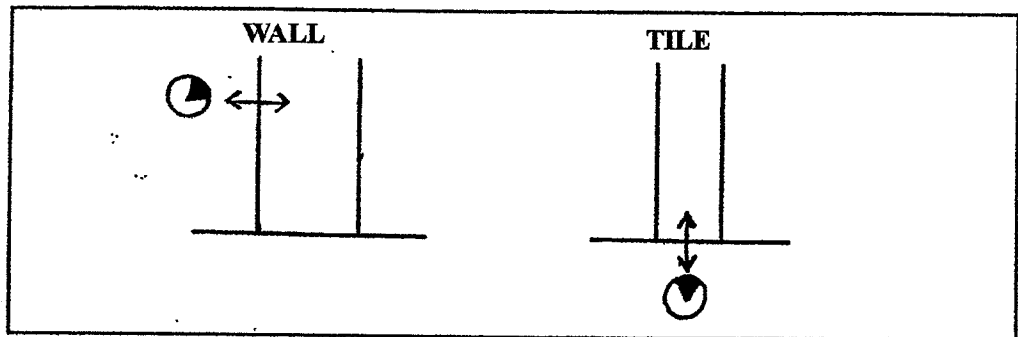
Horizontal and vertical vibration of a wall and a tile.
